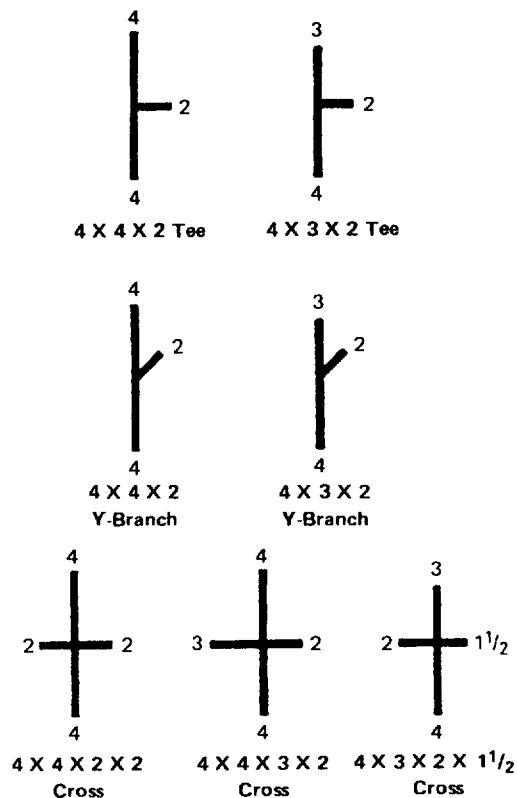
IDENTIFICATION OF REDUCING FITTINGS
